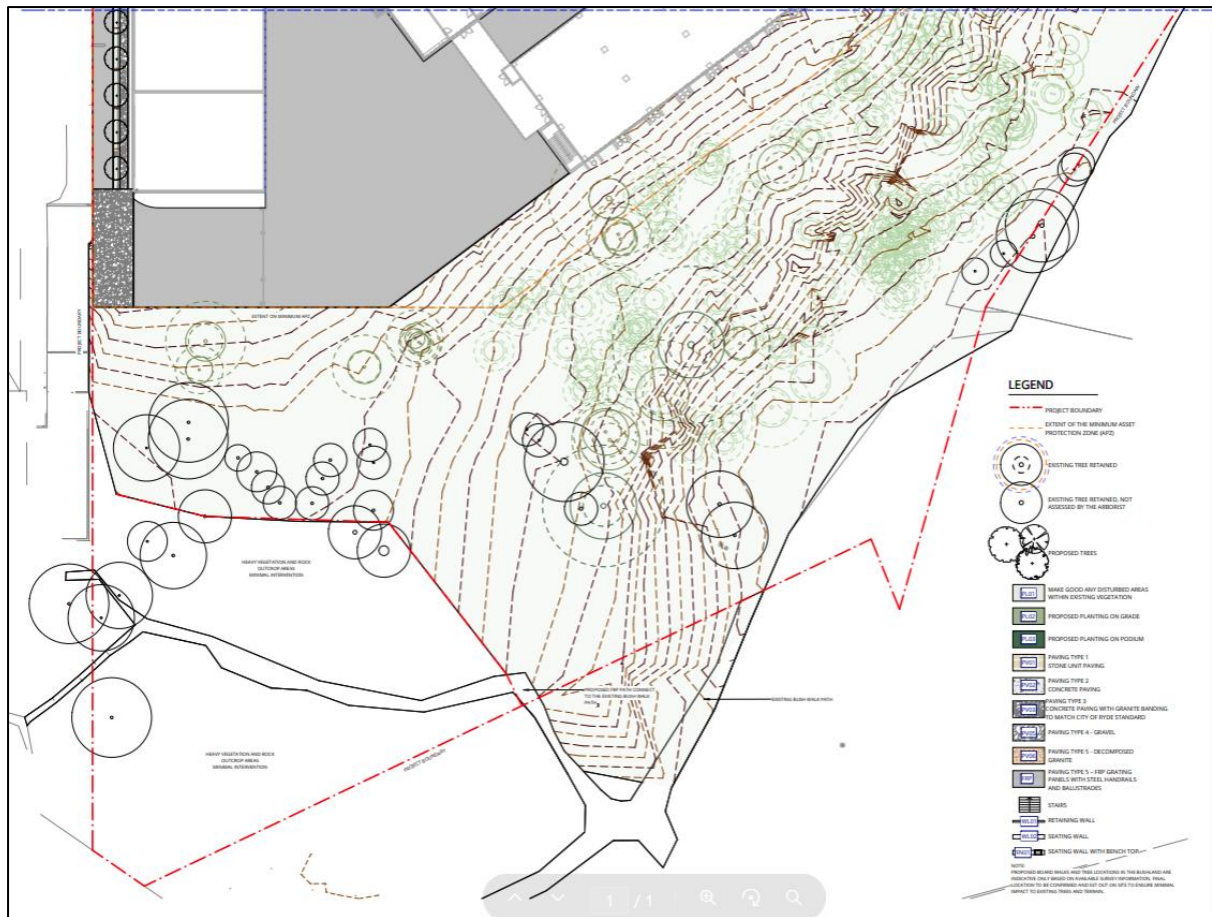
Proposed Removal of Western Walking Track (Source: Arcadia, 2025)
